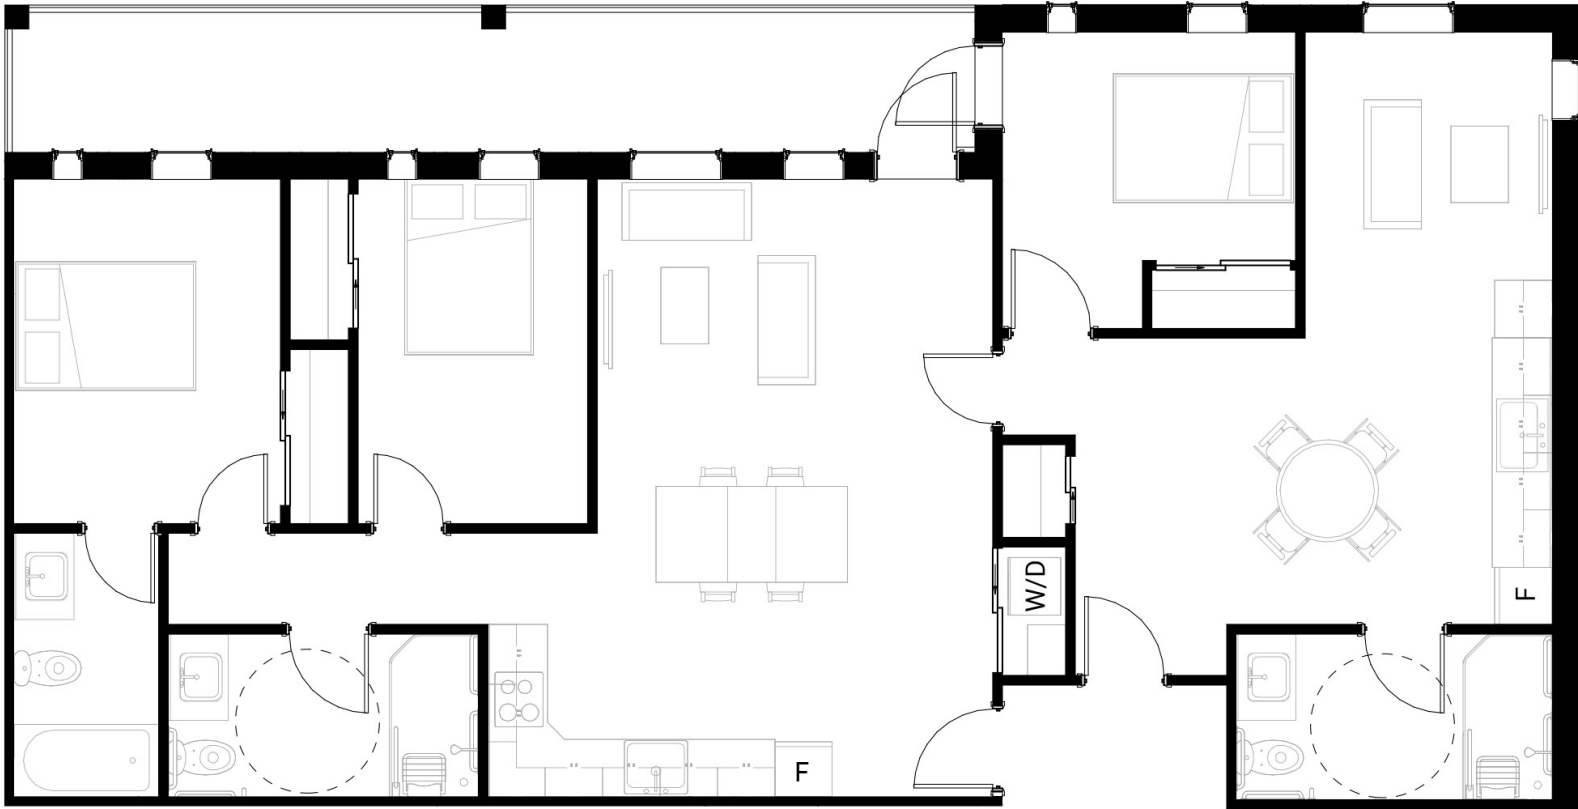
Unit Type 7 Floor Plan | Scale: 1:75.
